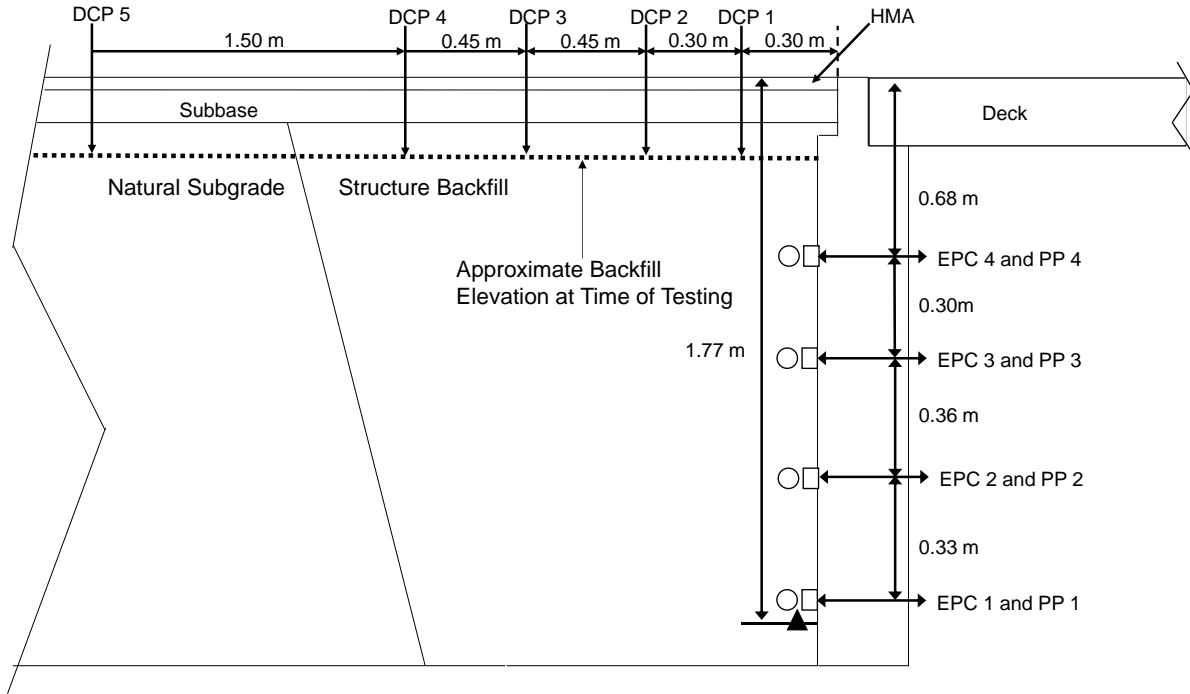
Cross-sectional view of the bridge abutment showing EPC and PP sensor locations and DCP test locations at Slovak Valley Creek Bridge
